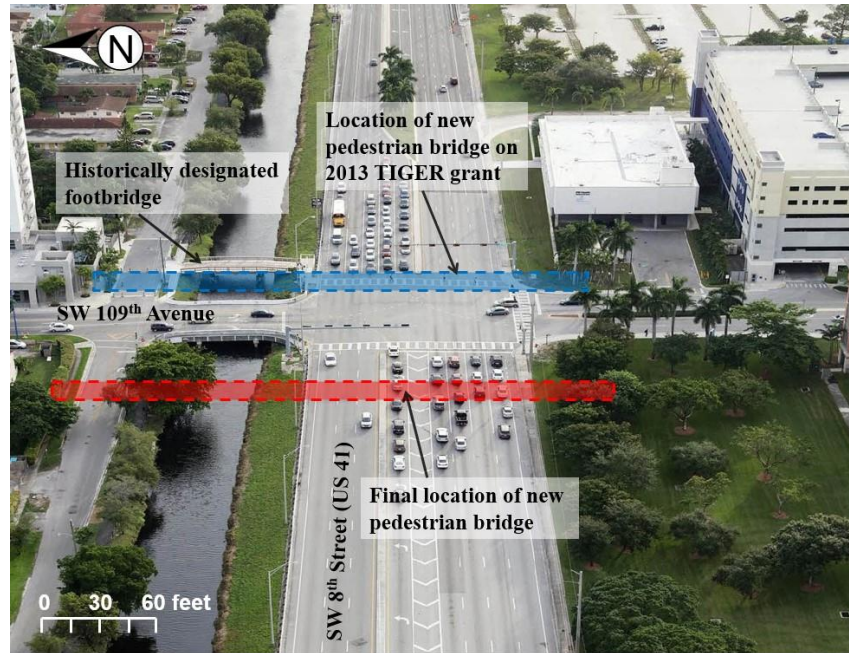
Final location of the new pedestrian bridge west of the SW 8th Street / SW 109th Avenue intersection (Source: Munilla Construction Management (MCM) modified, Date of Photograph: 10/26/2016)
